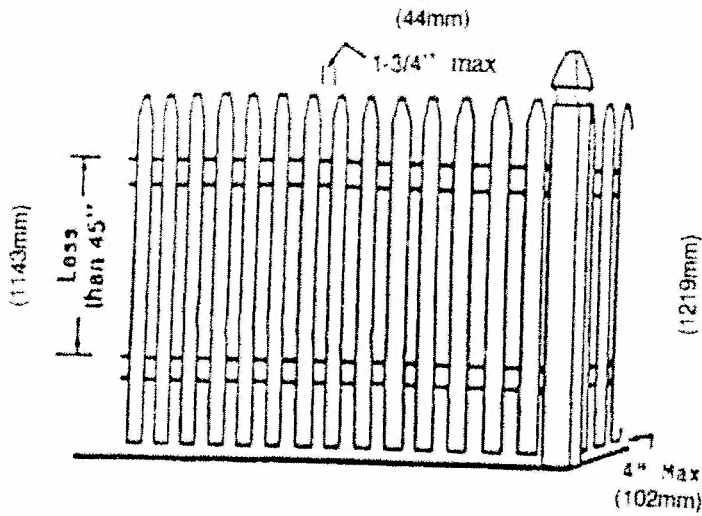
FIG. A IF HORIZONTAL MEMBERS ARE LESS THAN 45° APART, THE SPACE BETWEEN VERTICAL MEMBERS SHALL NOT EXCEED 1-3/4".
